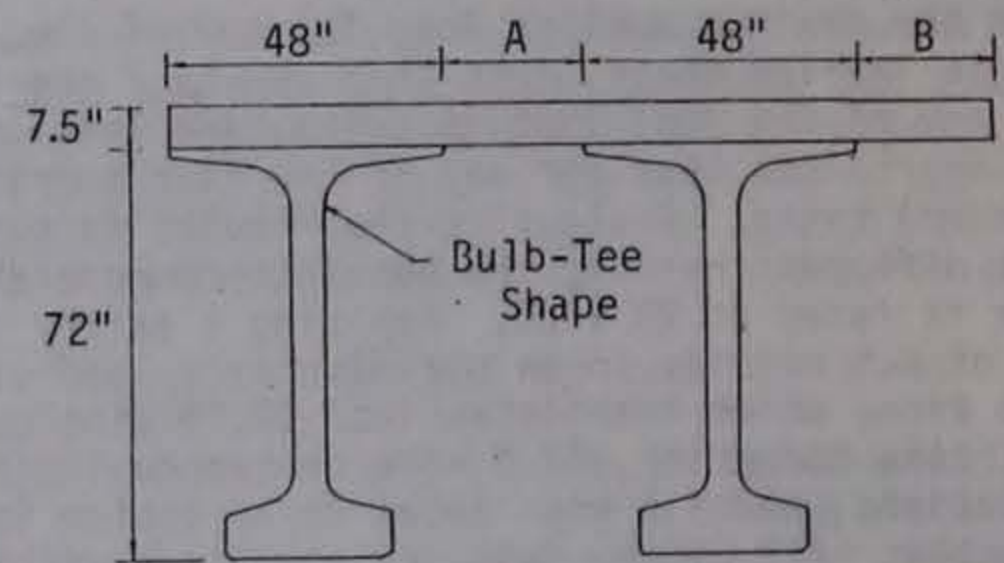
Section Properties for Decks with Bulb-Tee Girders
